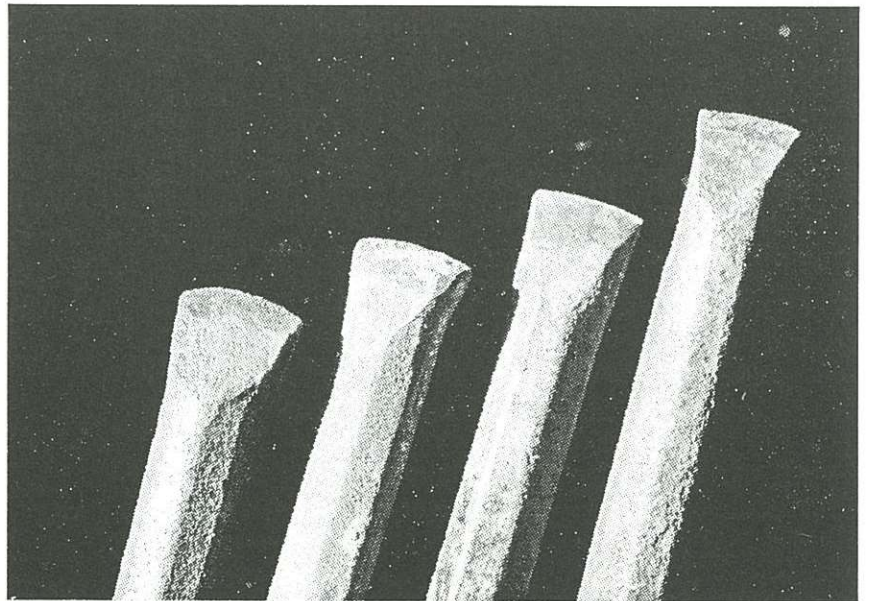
A set of four 7/8 in. stock drills found together in old workings. L to R. starter steel (1 3/16 in. cutting edge) and three changes (1 1/8 in., slightly over 1 1/16 in., and 1 in. cutting edges) (all cir. 1880).
